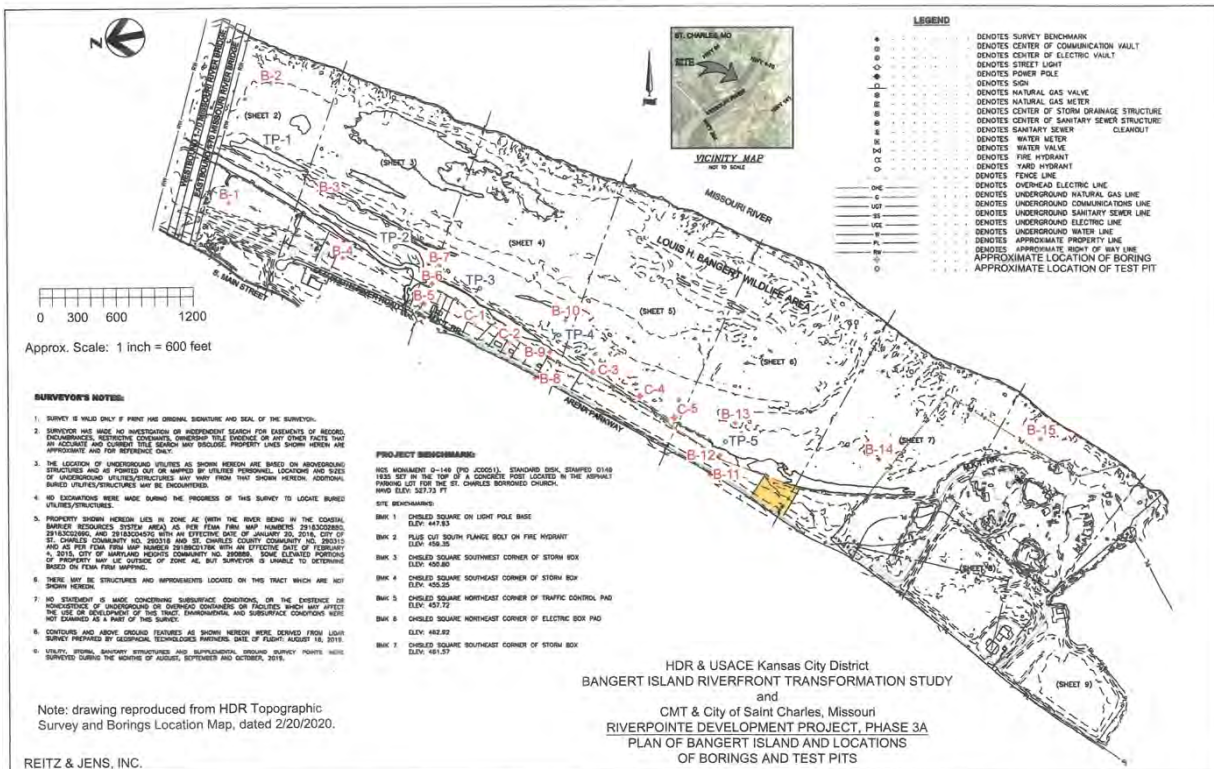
Plan map showing locations of borings (B- and C-) and test pits (TP-).
